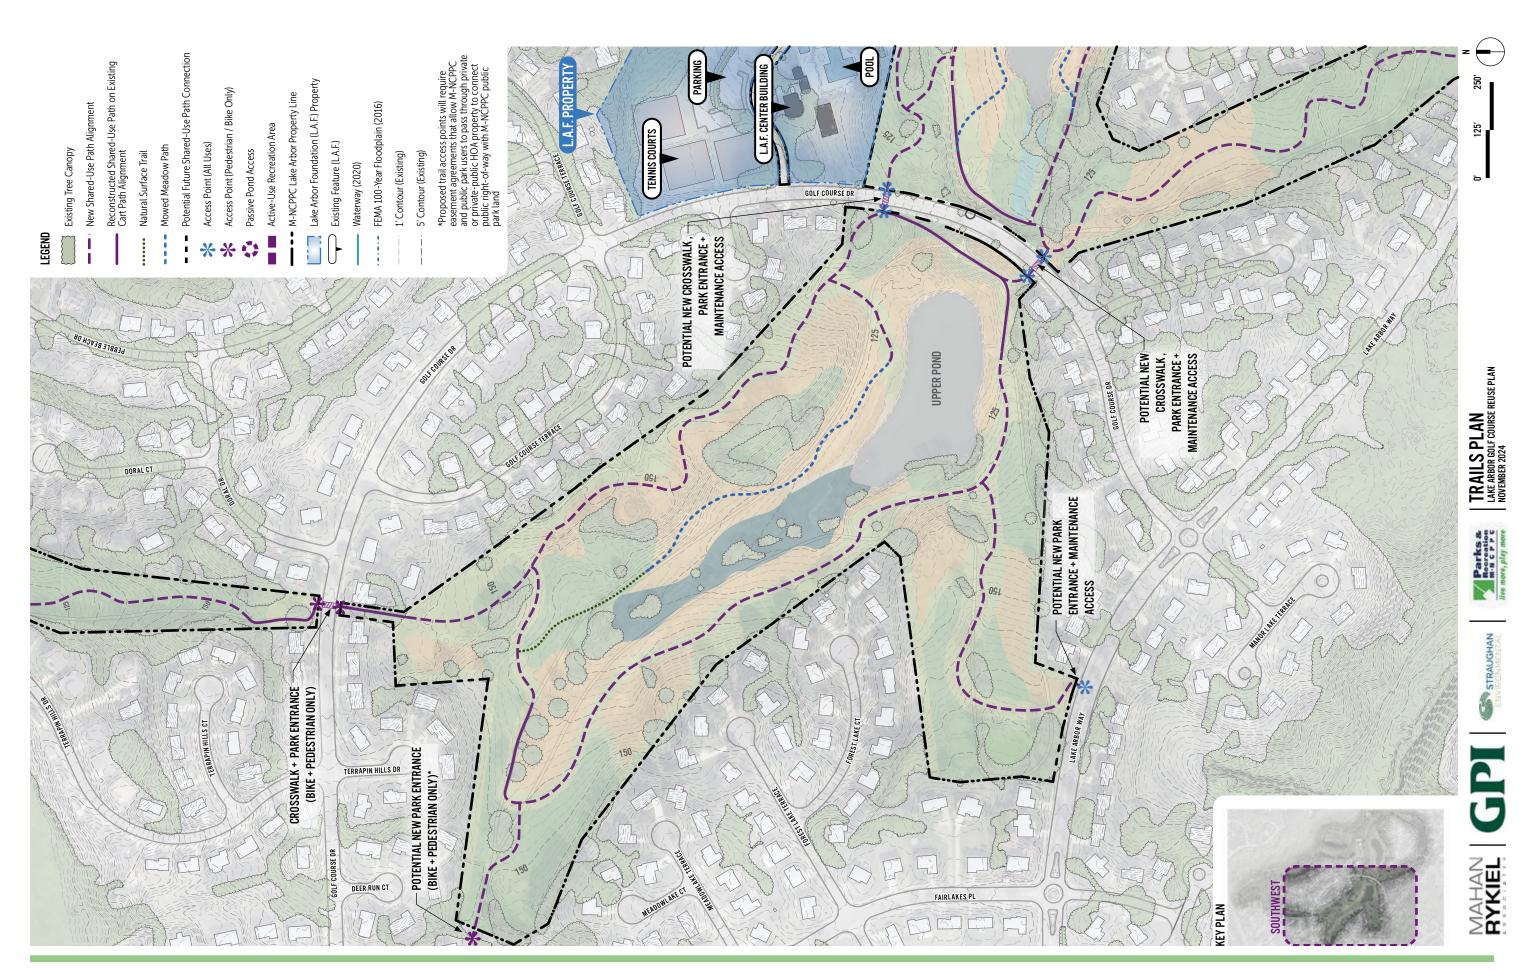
Enlargement (Southwest) of the Trails Plan.
